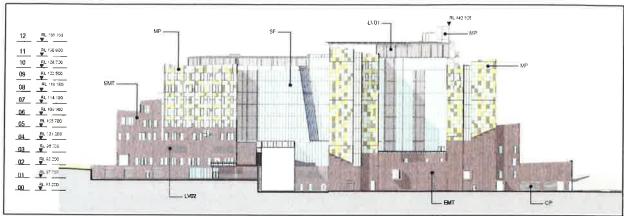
| Northern elevation (Source: Applicant's RtS 2018)
